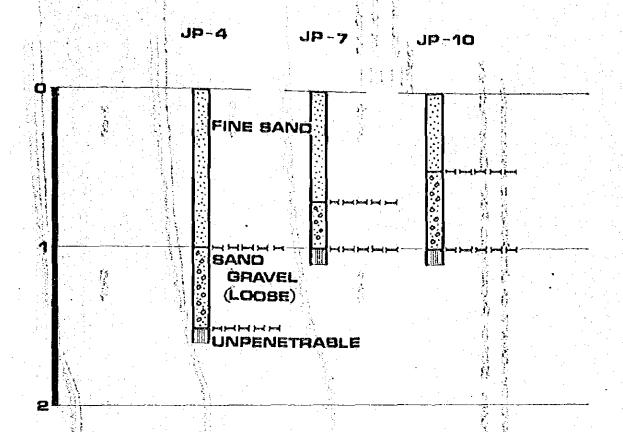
JET PIERCING BORING TOR PROPOSED SITE FOR PACASMAYO PORT CONSTRUCTION
